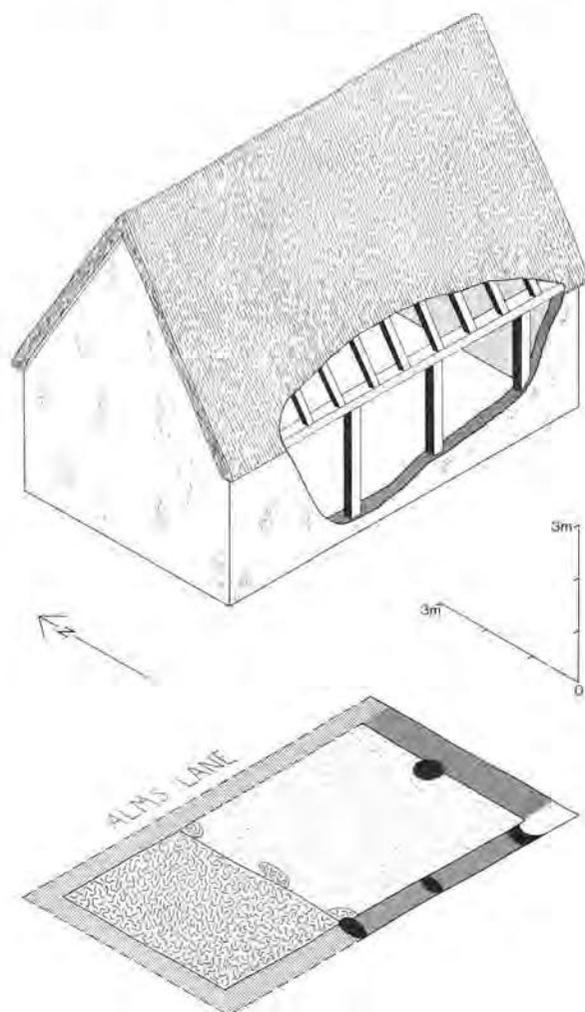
Site 302N. Reconstruction and plan of building A3ii, Period 5, showing use of timber lacing
